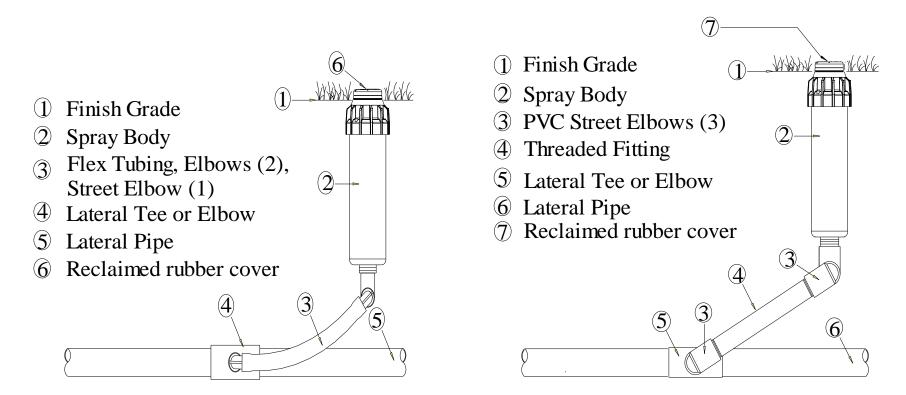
Figure II FLEX TUBE/SWING JOINT ASSEMBLY
